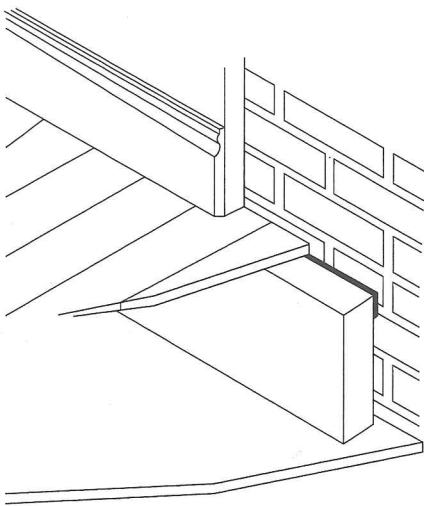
Intumescent coated foam strip used to seal between a floor joist and a brick wall
